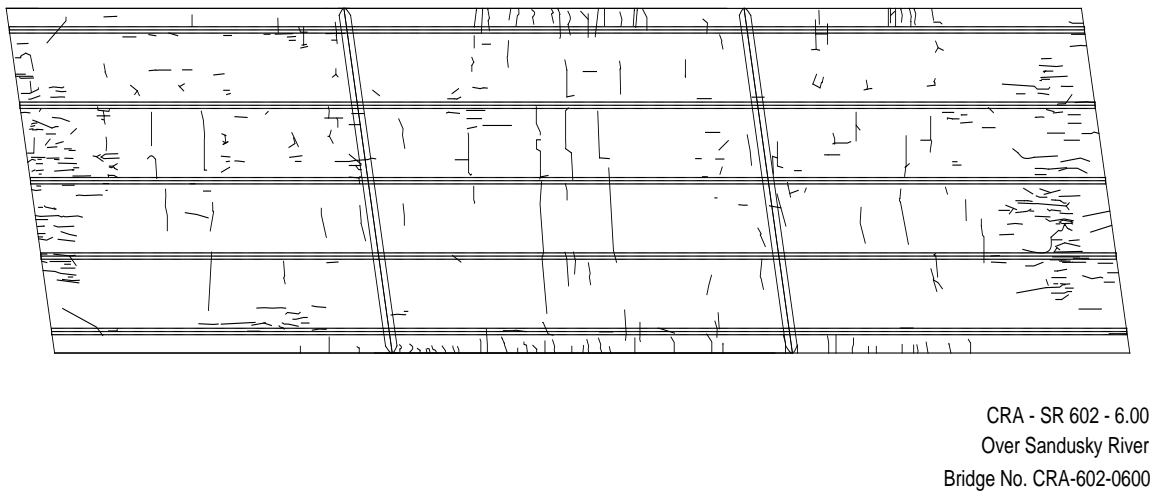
Crack map interposed with structural layout for Bridge Number CRA-602-600
